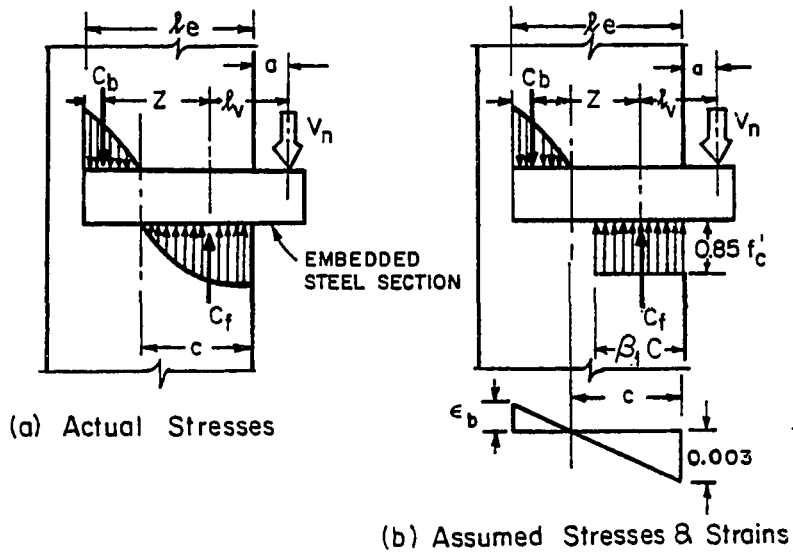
Actual and assumed stresses and strains in concrete adjacent to embedded steel section (Ref. 31).
